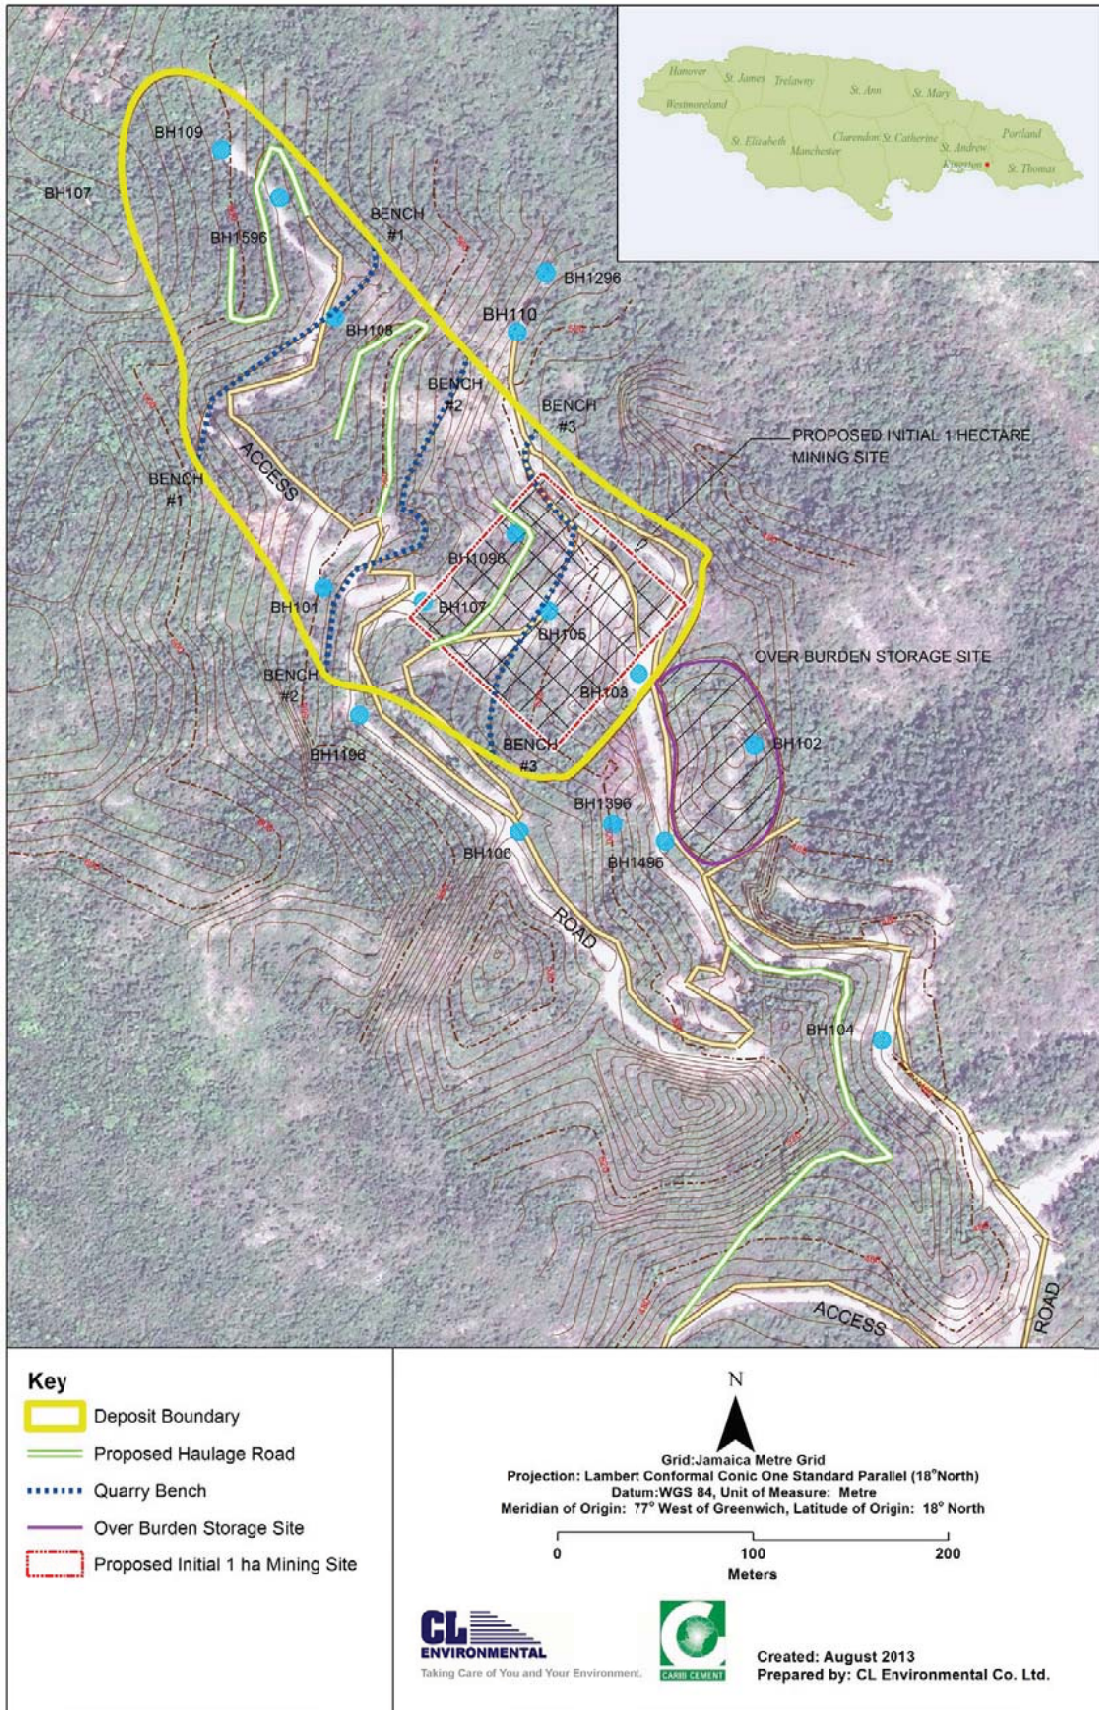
Proposed Halberstadt site layout, along with locations of boreholes
